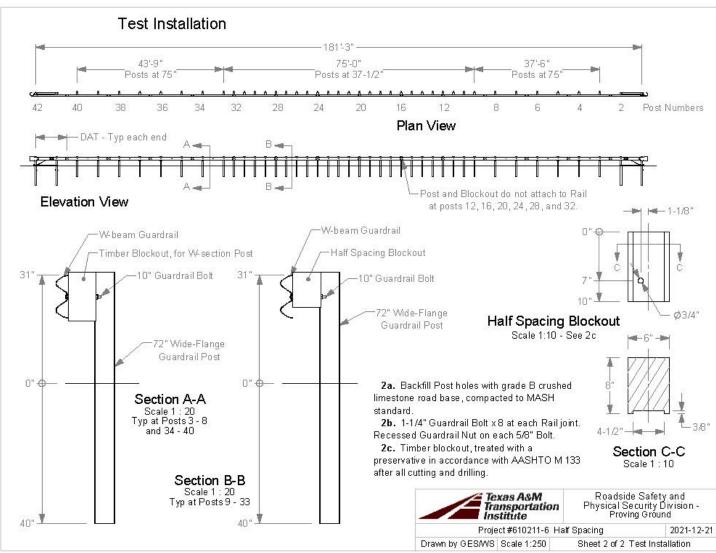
presents overall information on the MGS with half post spacing and shortened blockouts, and Figure 5.18 provides photographs of the installation. Appendix H provides further details of the MGS with half post spacing and shortened blockouts.
